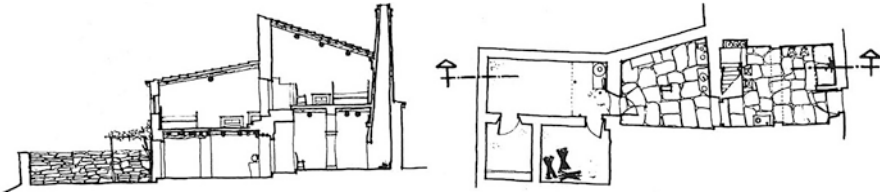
Reguengos de Monsaraz: floor plan and section (AAP 1961)
